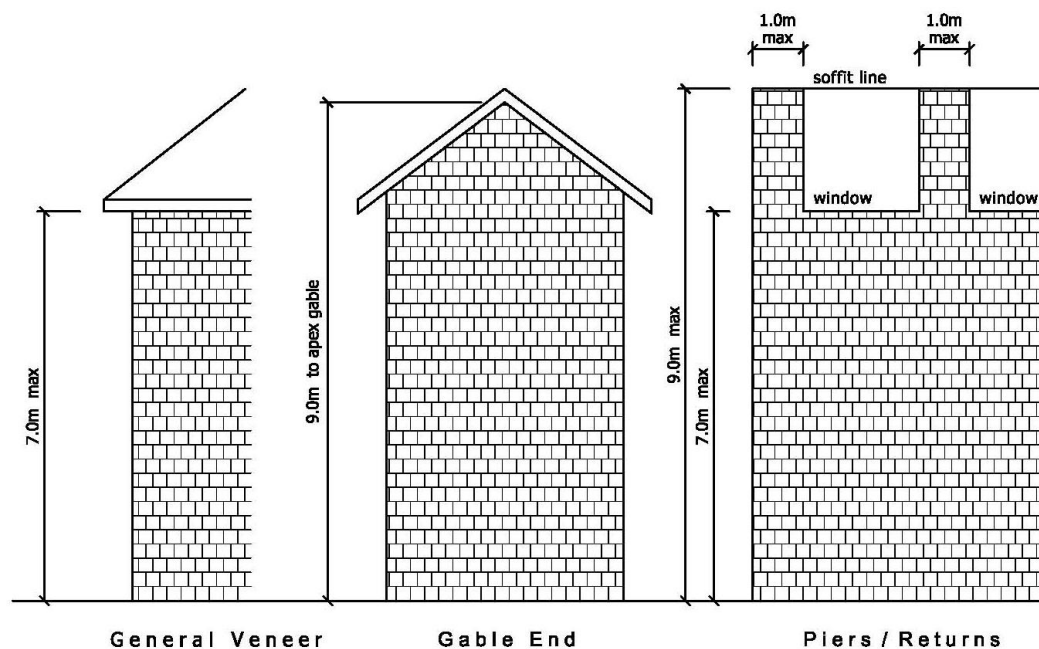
Maximum Veneer Heights for two-storey stack bond construction
